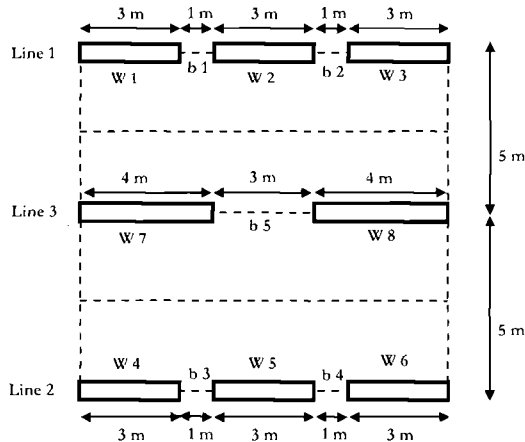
The Reinforced Masonry Building of Example 8.2: Floor Plan
